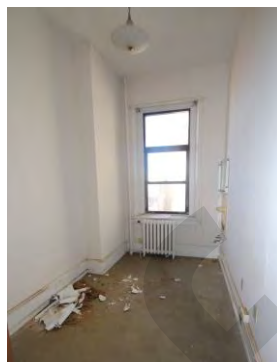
(center): Convent, interior, second floor of 1914 section, typical bedroom view east
